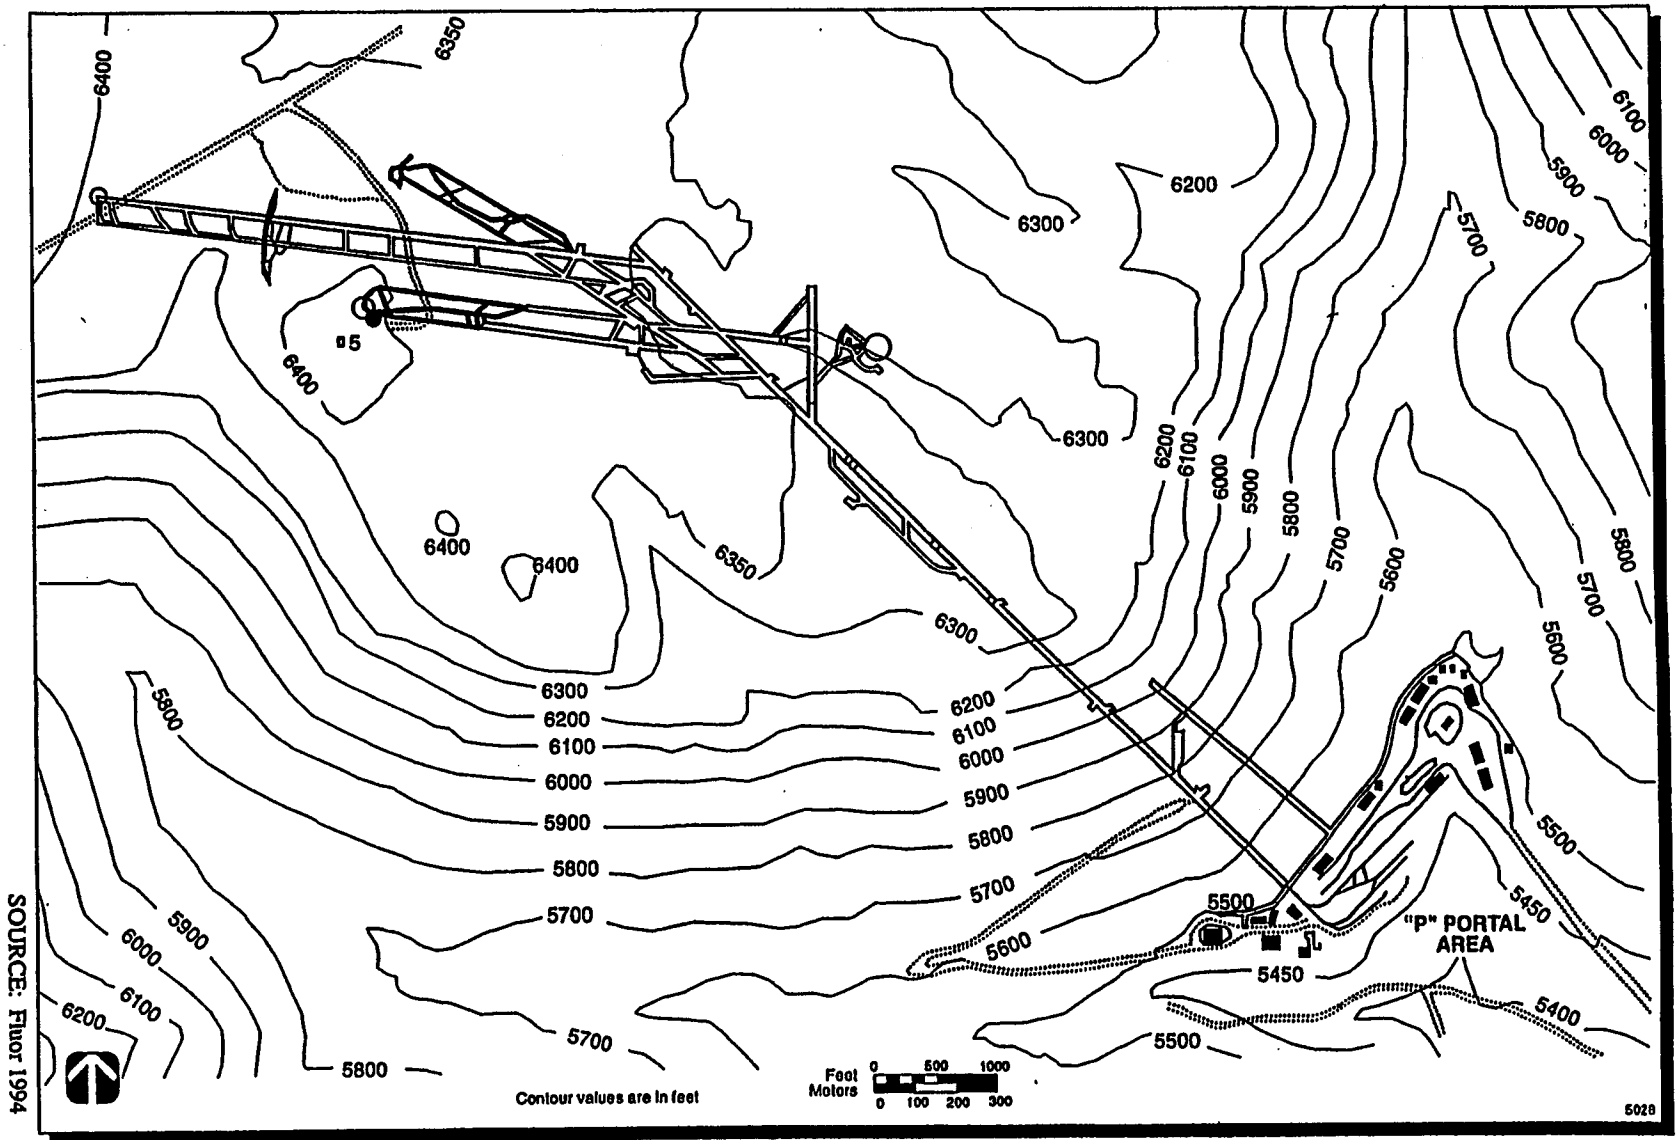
Layout of P-Tunnel at the Nevada Test Site.
